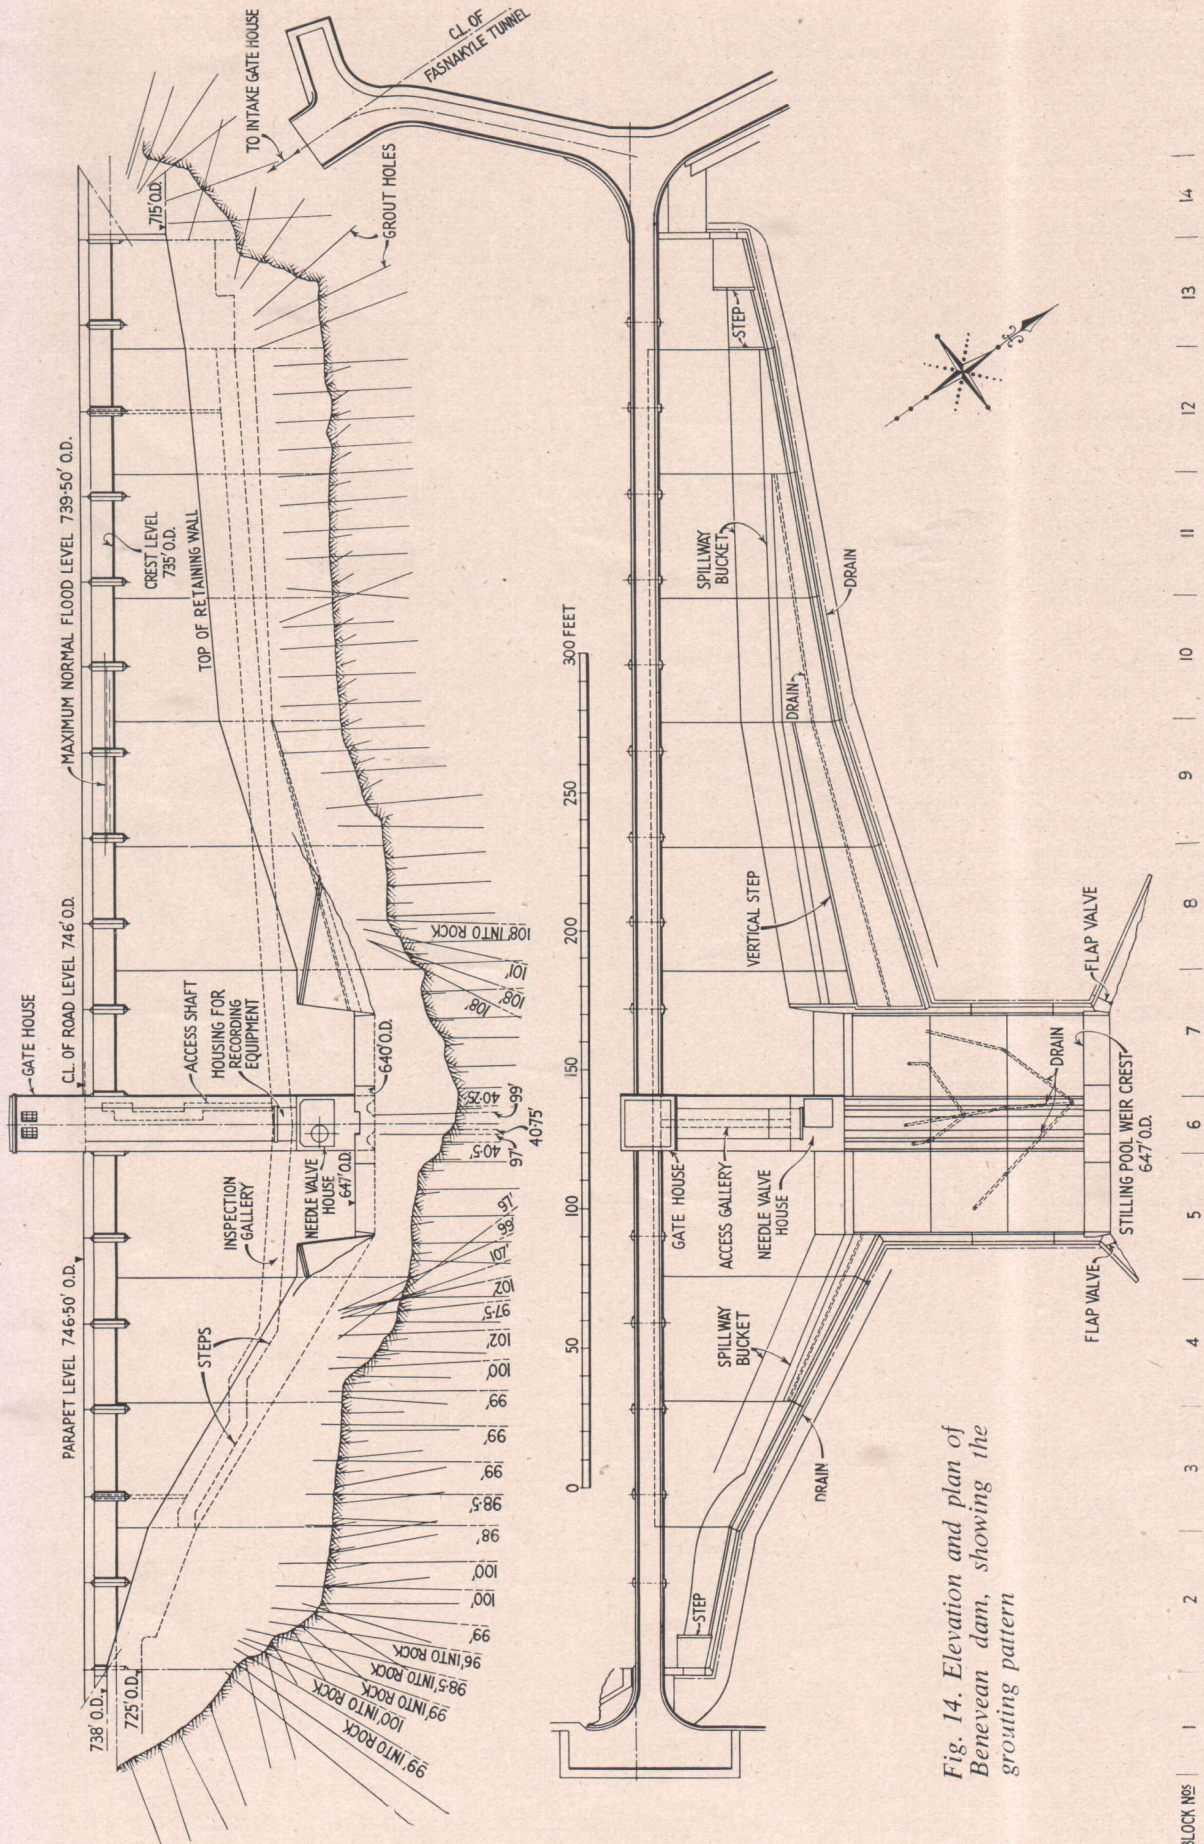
Elevation and plan of Benevean dam, showing the grouting pattern
